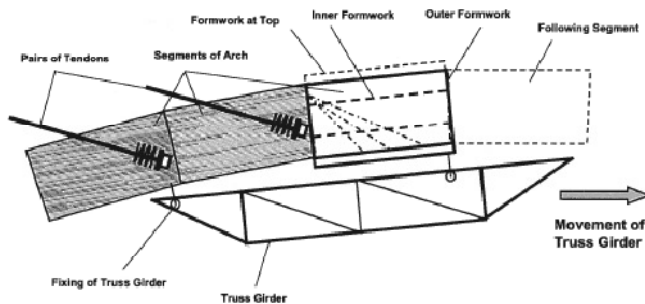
Movement of the truss girder into position for the next segment. Bilfinger Berger (2003)
